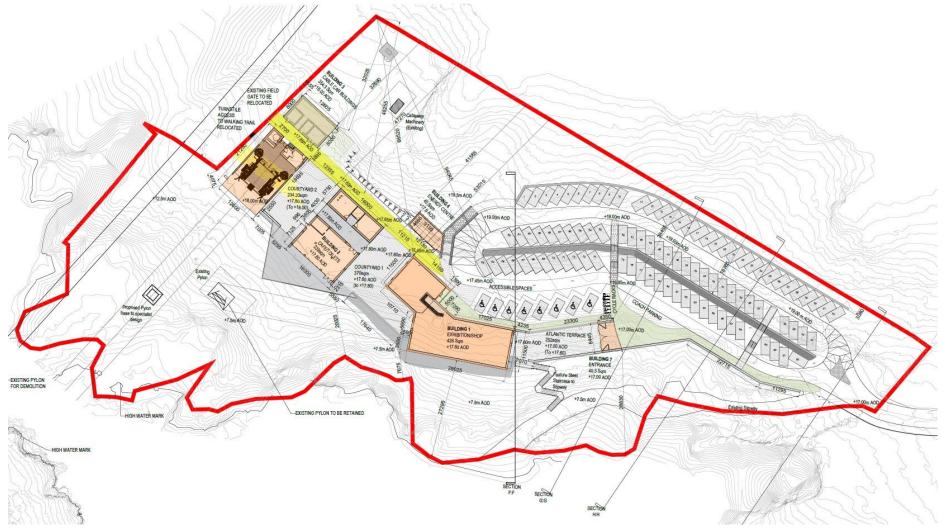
Proposed layout of mainland side of site (not including R572 works)
